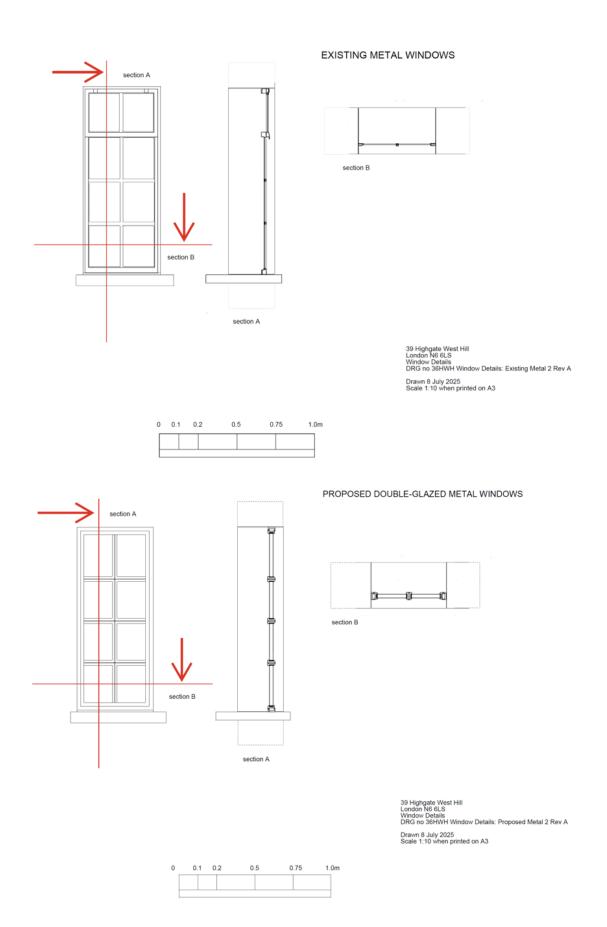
Existing and proposed window section on southwest side elevation (Source: submitted documents)
